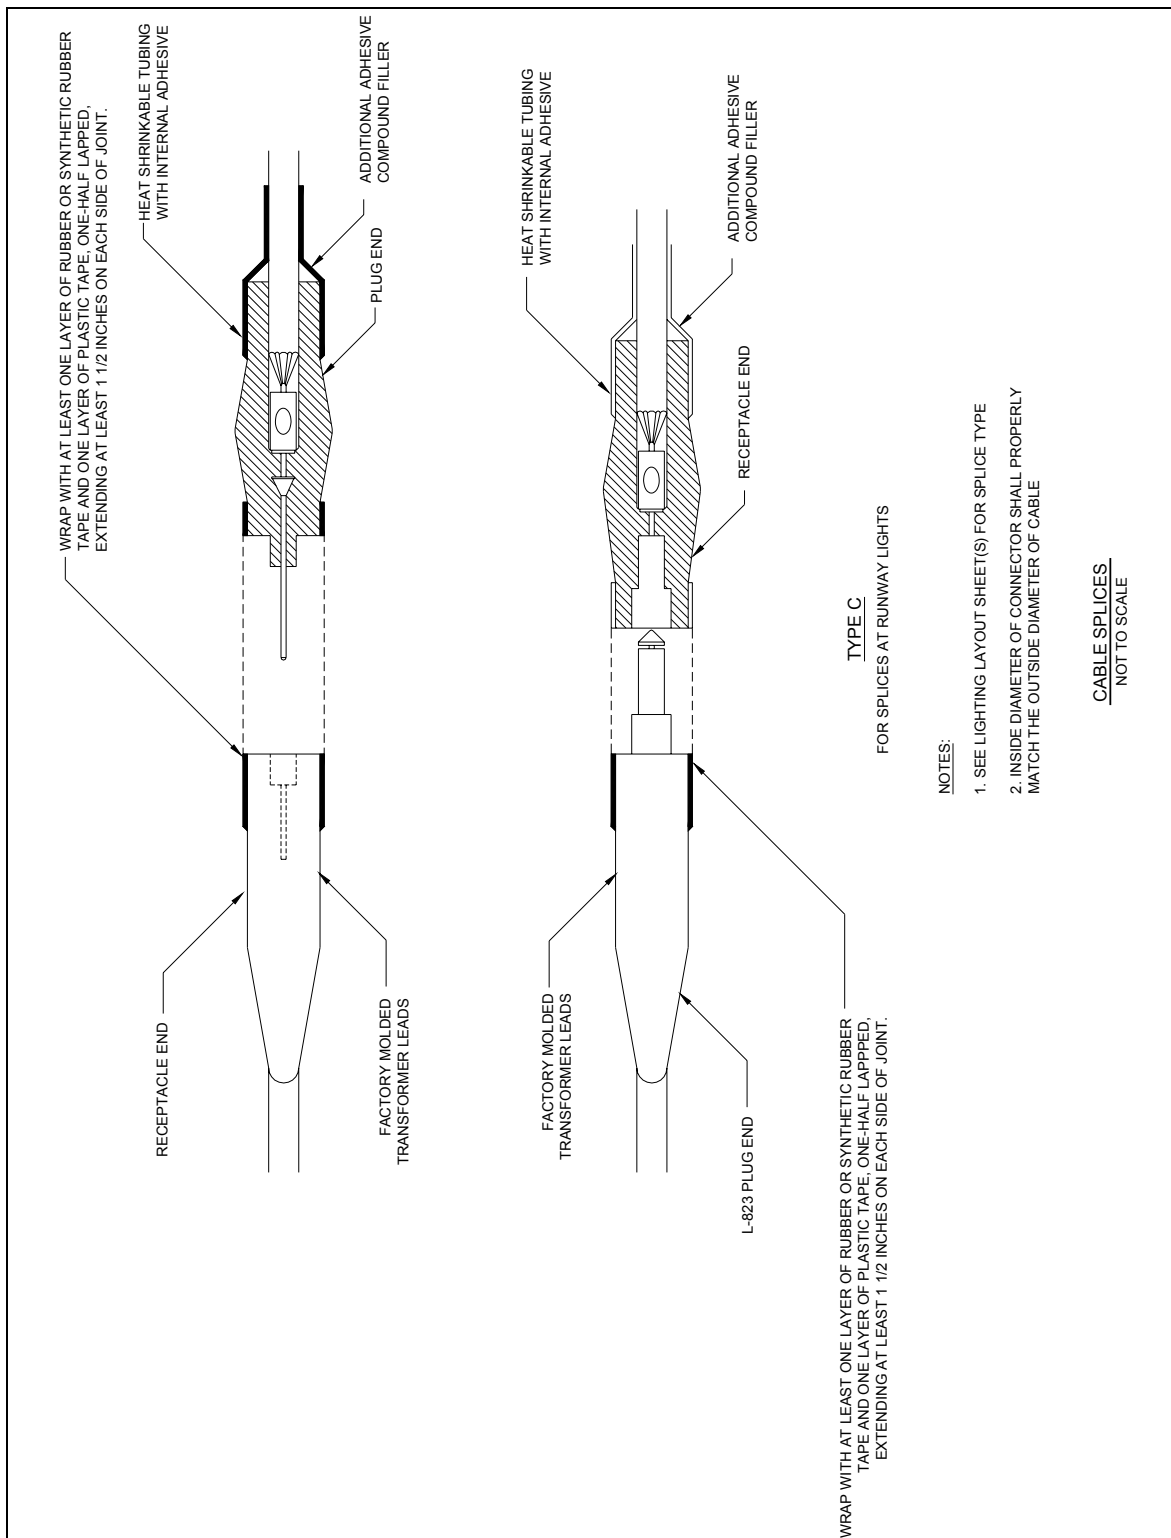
Standard Details for Underground Cable Installation – GL-600 Sheet 2F – Type C
